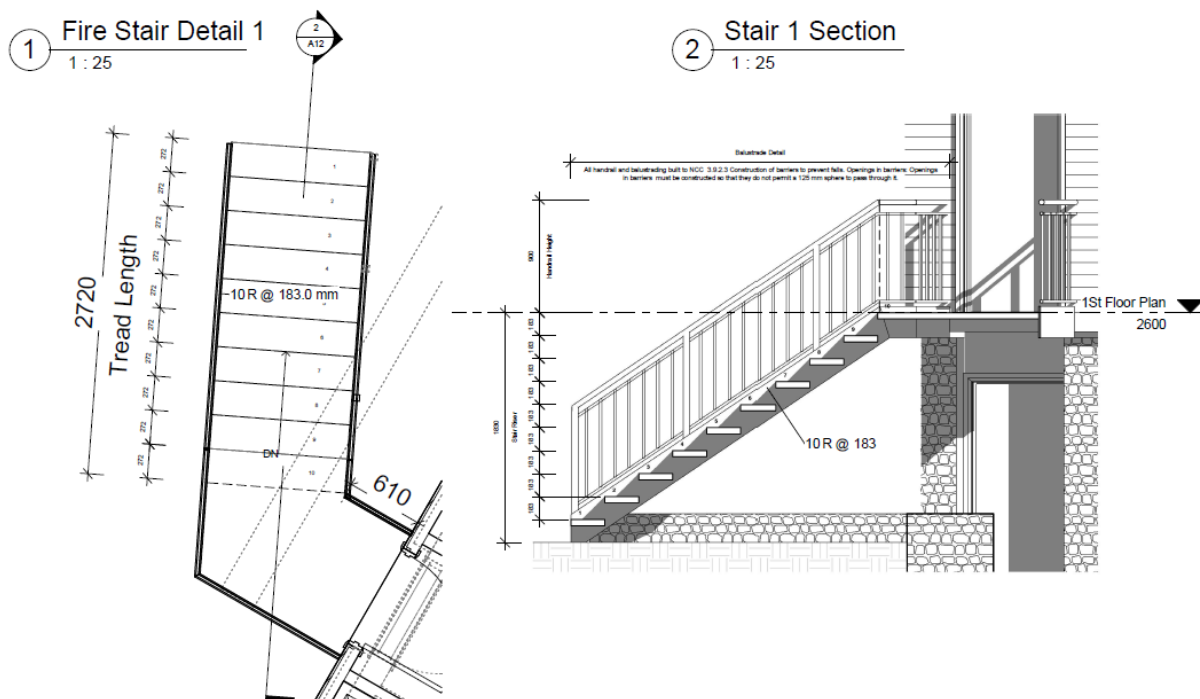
| The proposed northern fire exit stair (Source: Applicant's documentation)
